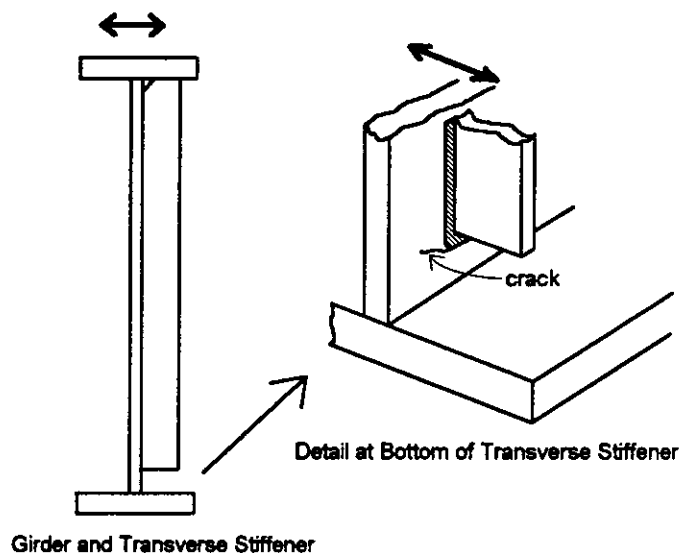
Example of fatigue cracking due to out-of-plane movement
